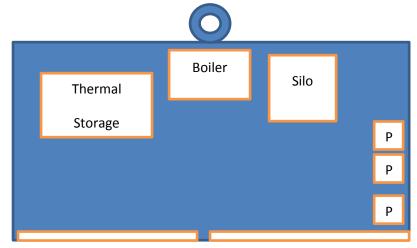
and 20 Boiler room layout, Elevation and Plan Views
